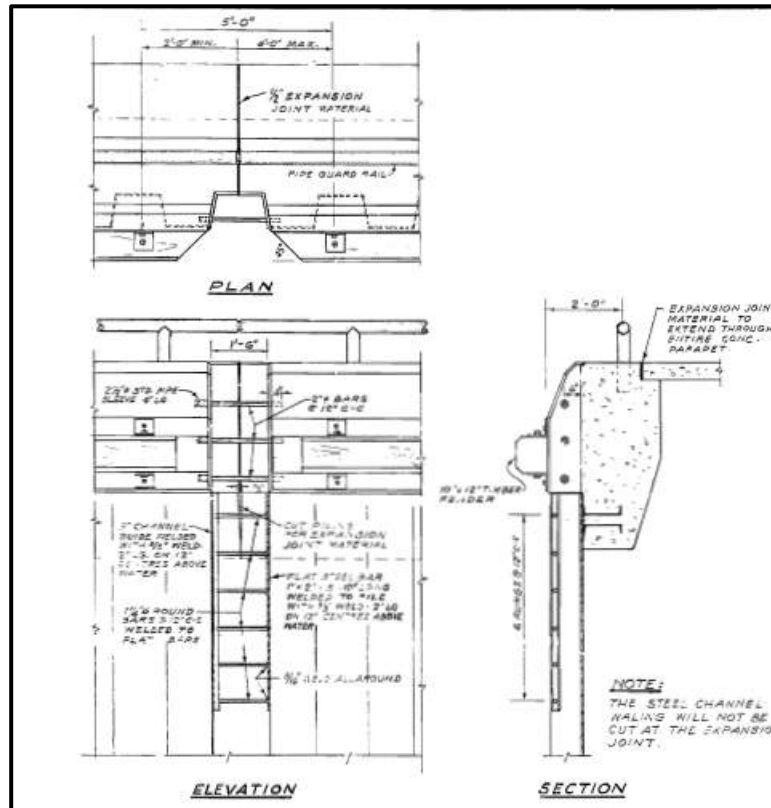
Details of Structure C Ladders from 1967 Wharf Reconstruction Plan, Public Works of Canada
